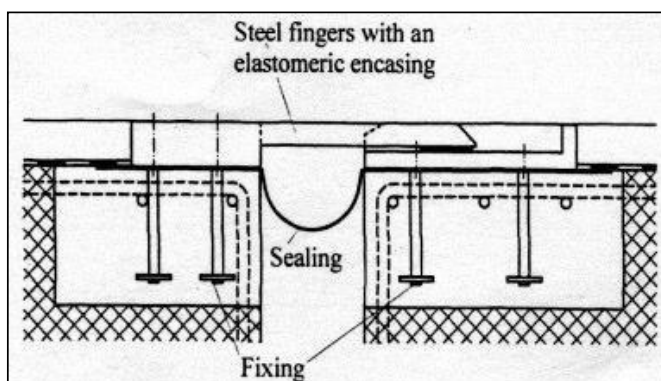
Cross Section of a Cantilever Finger Plate Joint
